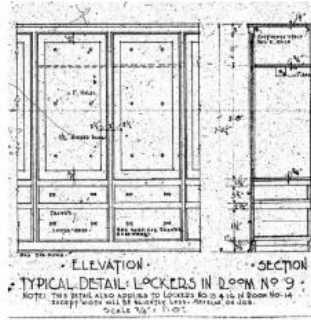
Drawing of built-in lockers in locker room (W. Horace Austin, Sheet 3)
